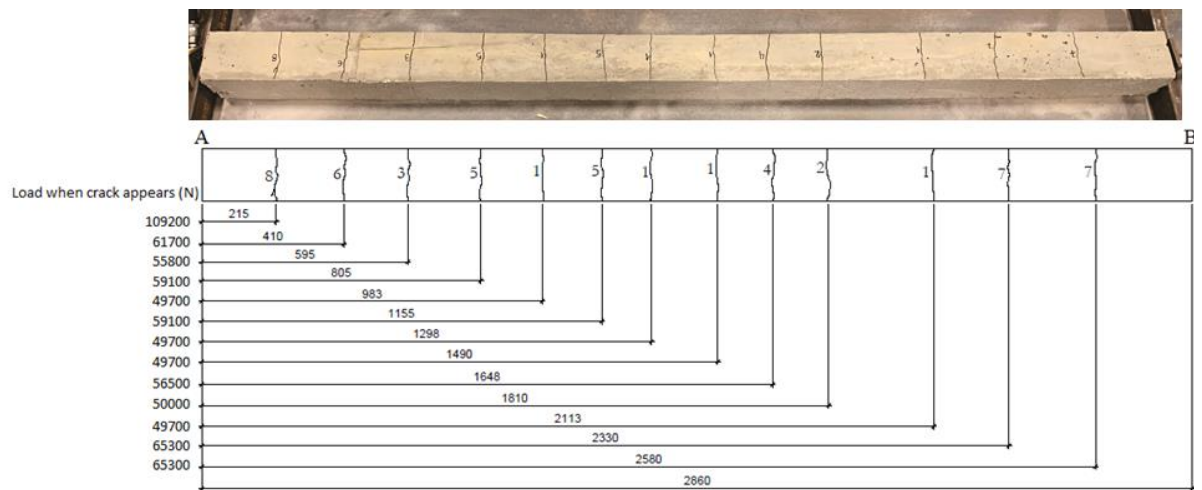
Prism test and crack pattern: #6 rGFRP – specimen 3.
